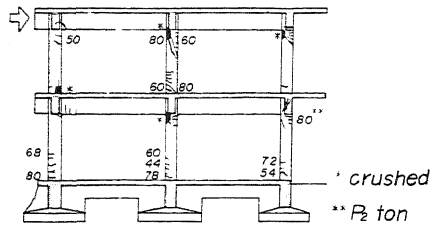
CRACK IN MAIBARA OPEN FRAME
